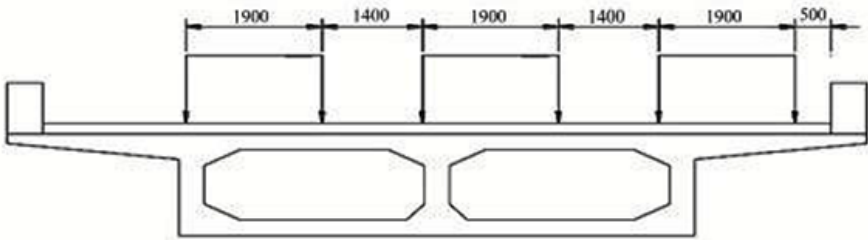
Transverse loading layout of vehicles (Unit: mm)
